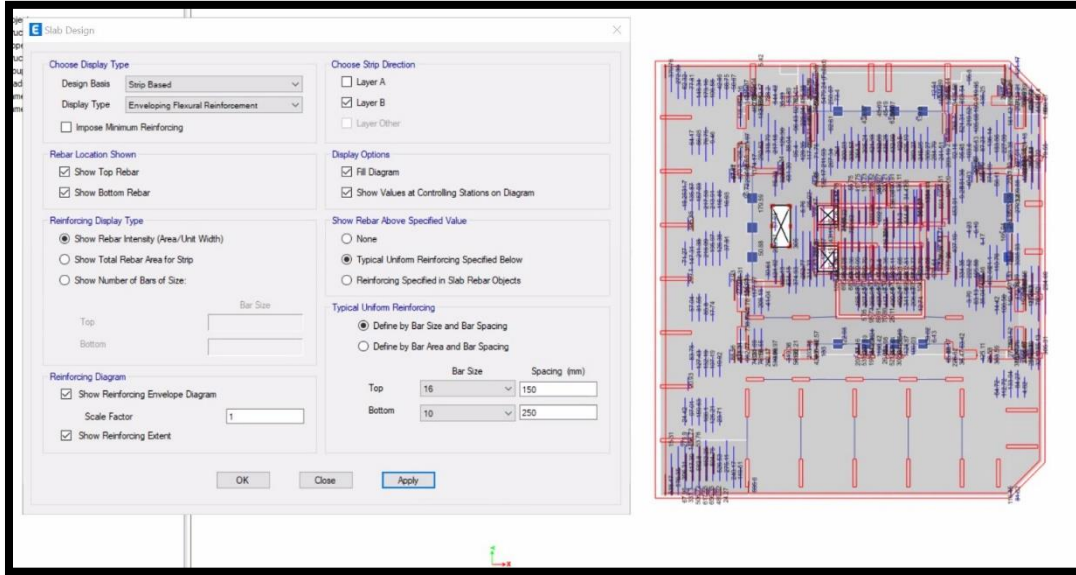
End-Spans Y-Direction Reinforcement for 4th Basement Floor
